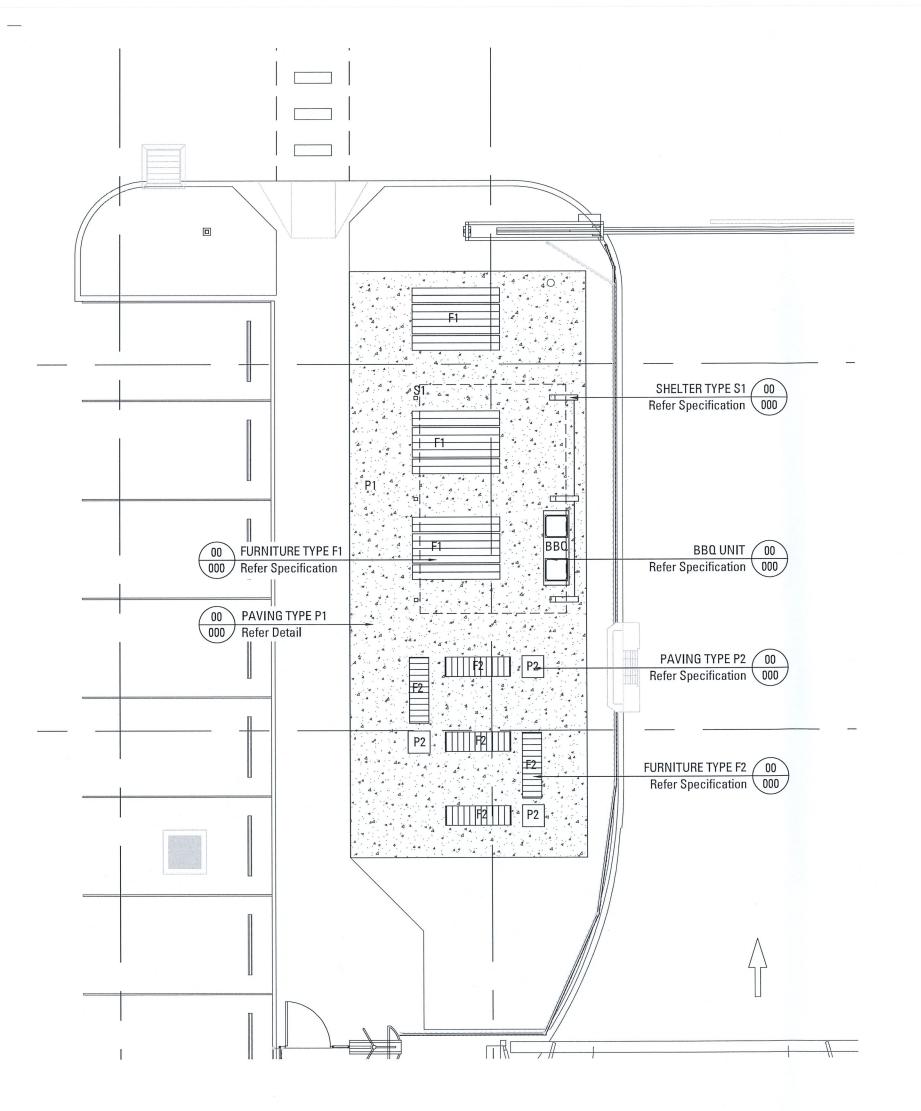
Drawing Name Detail Plan - Setout + Grading
